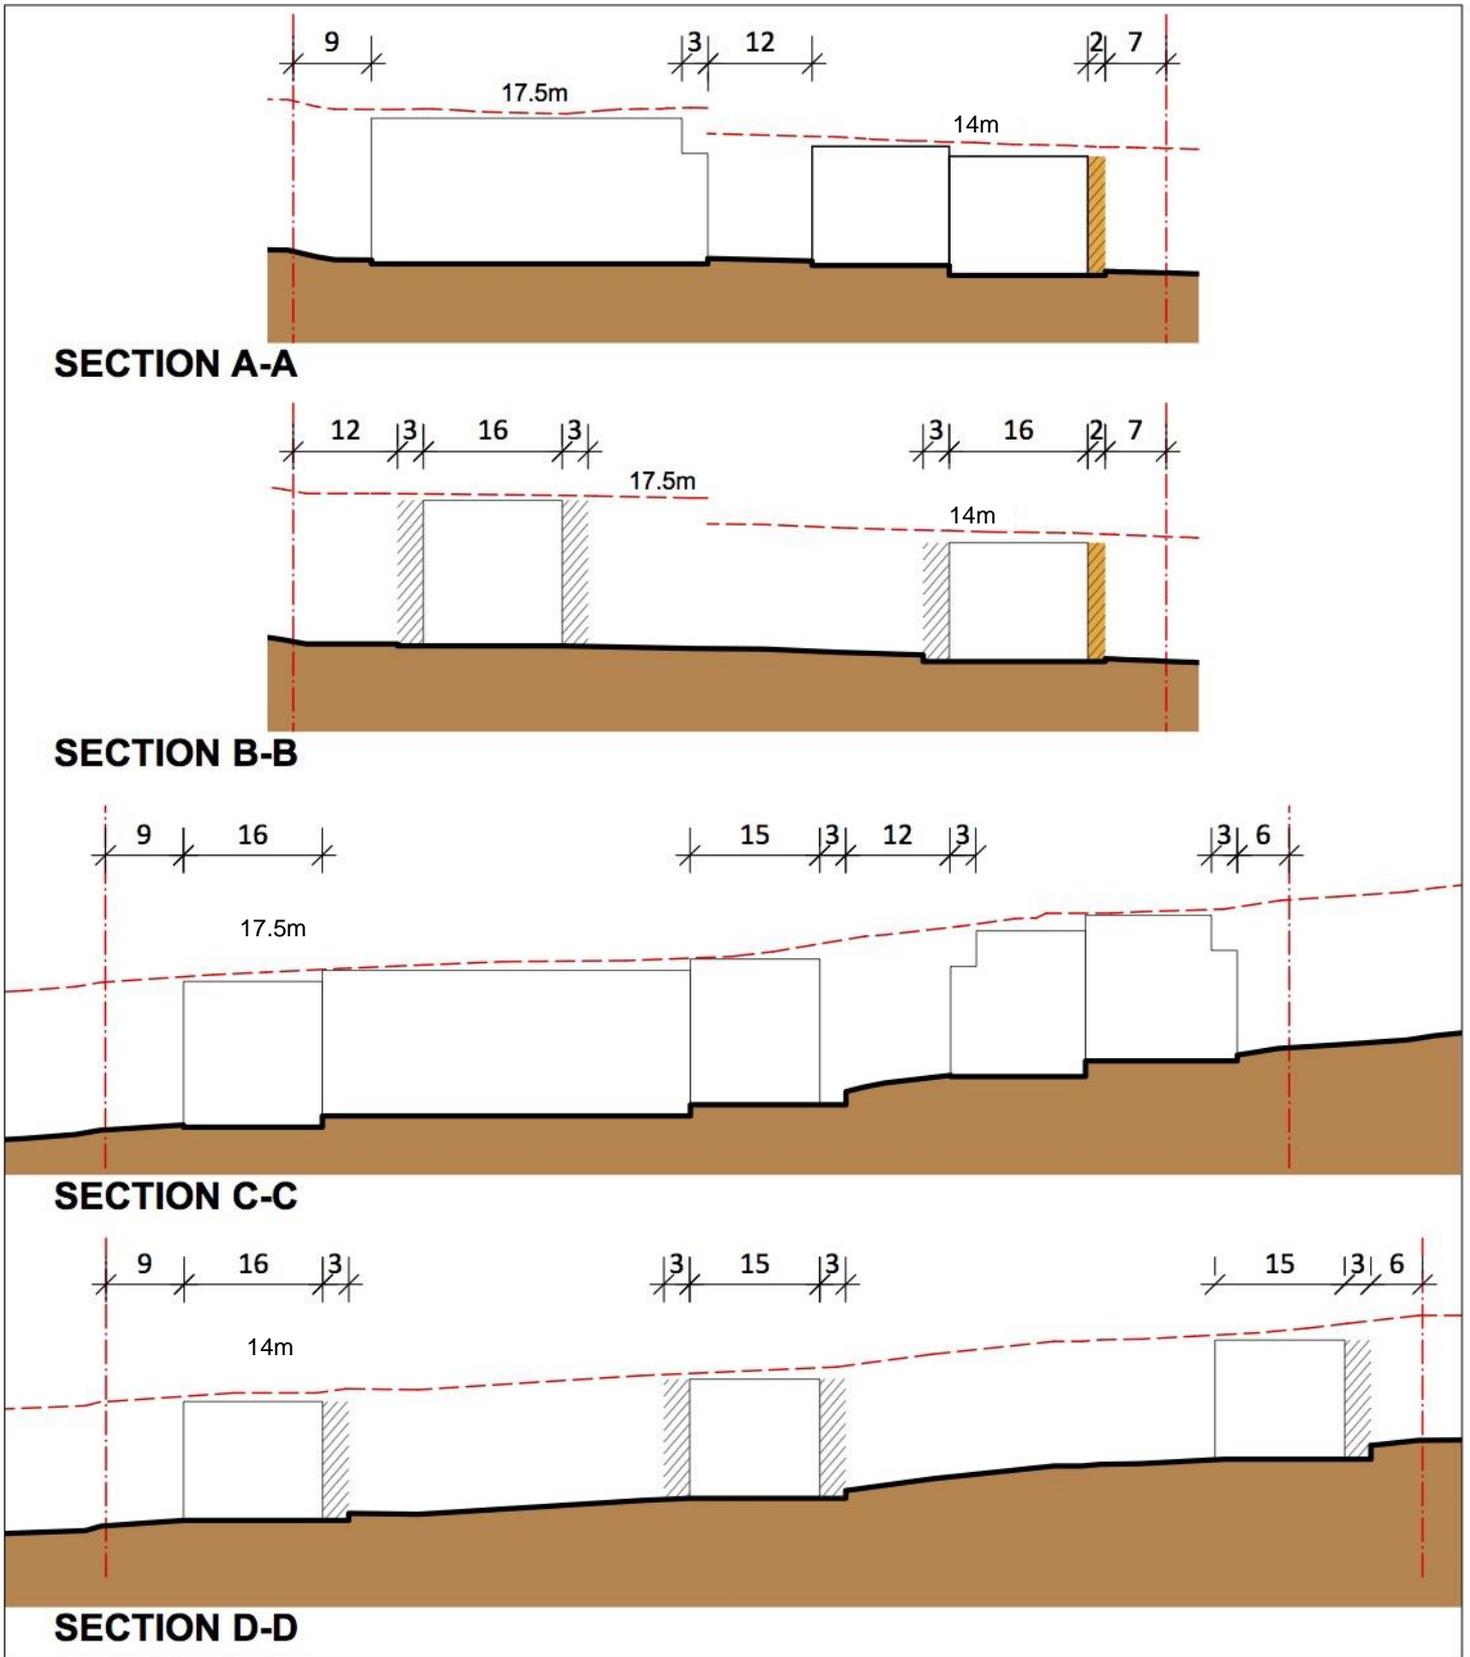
BUILDING ENVELOPES AND ARTICULATION
